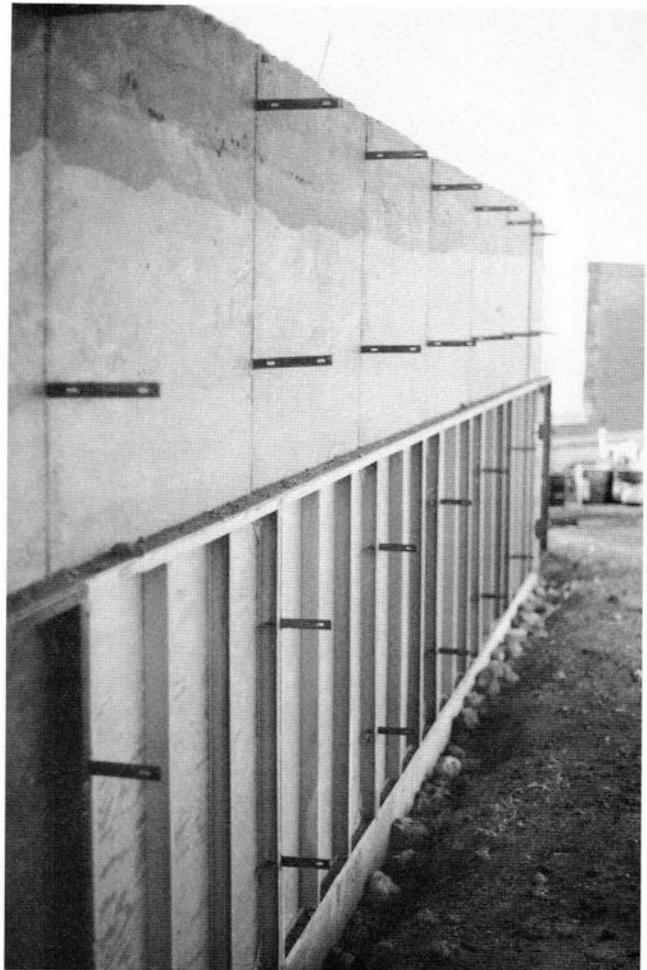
Removal of top forms exposing the metal form fasteners that are later cut off at the wall surface. Huston Construction Company building site, Edgewood.
